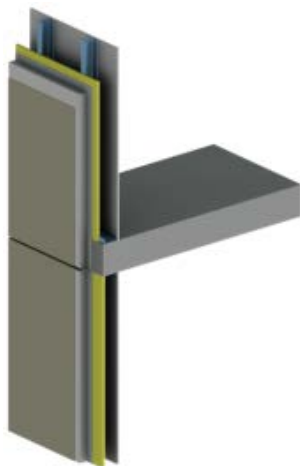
Fully Exterior Insulated EIFS Steel Stud Floor Slab Intersection
